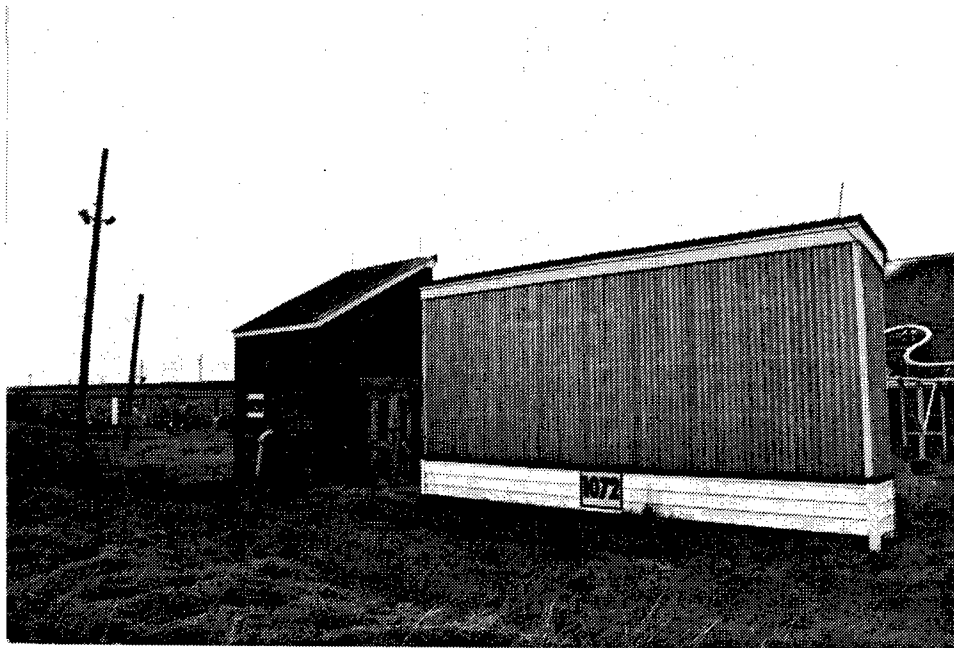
Building 1072 and Building 1090: Vacuum Houses.
